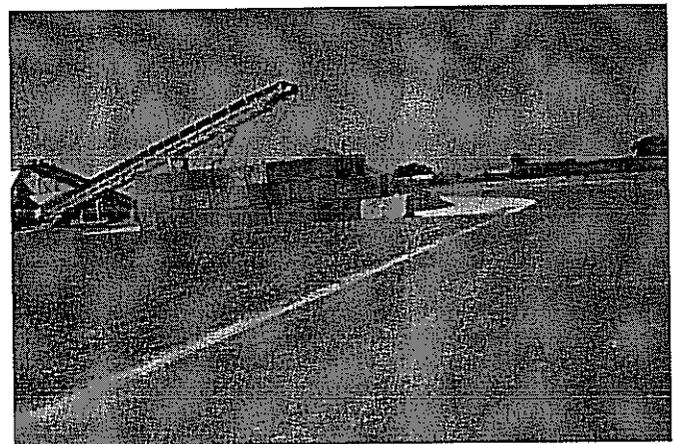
Another portion of the facility Note: the driveway areas throughout the facility generally have an asphalt surface
